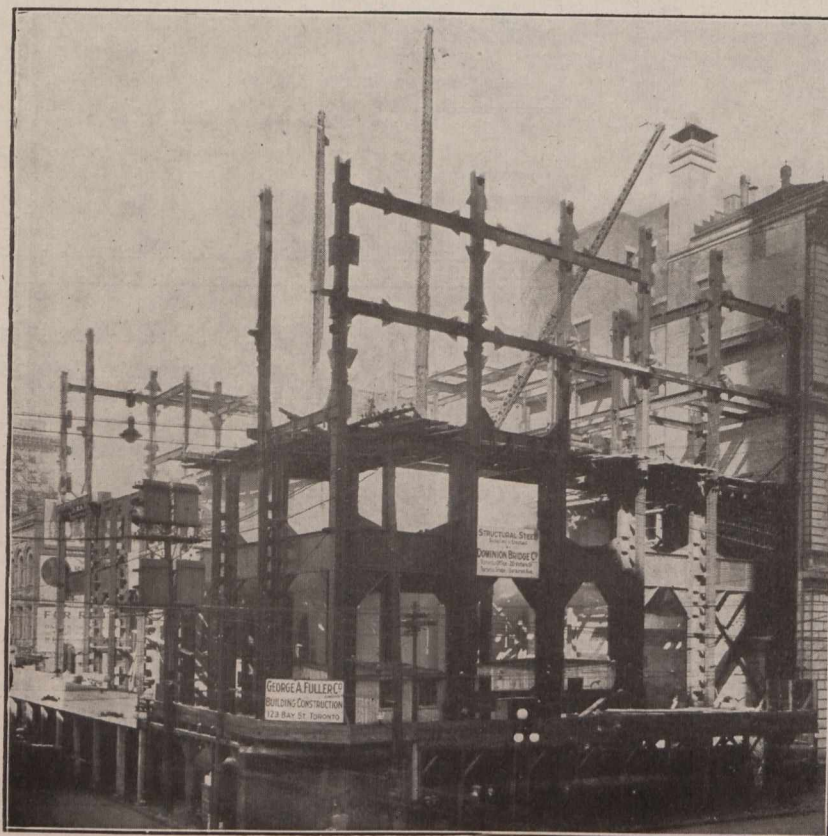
State of Erection of Royal Bank Building on March 20th, 1914.
